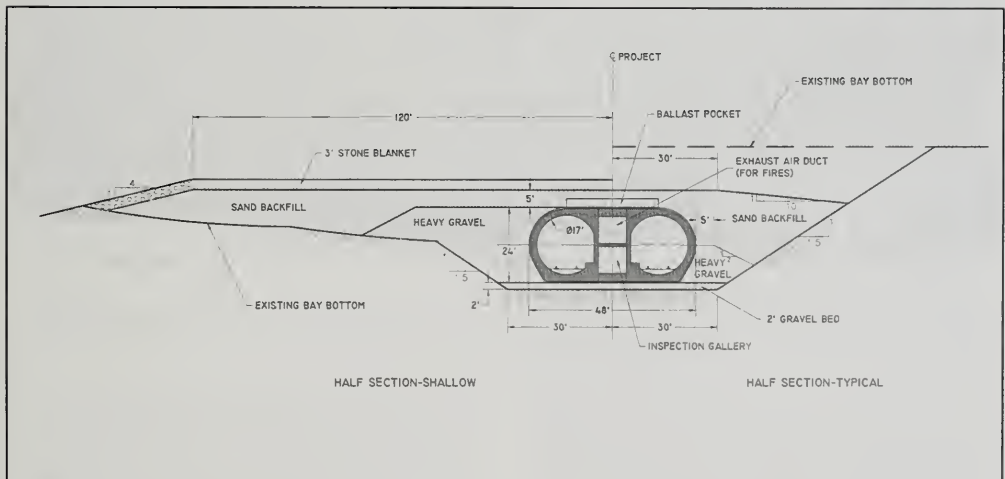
Typical cross-section through shallow and normal depth trenches excavated for the Trans-Bay Tube. Note the two-foot thick gravel bed that the tubes were set on, and the three-foot thick stone blanket used on the shallow half sections.
